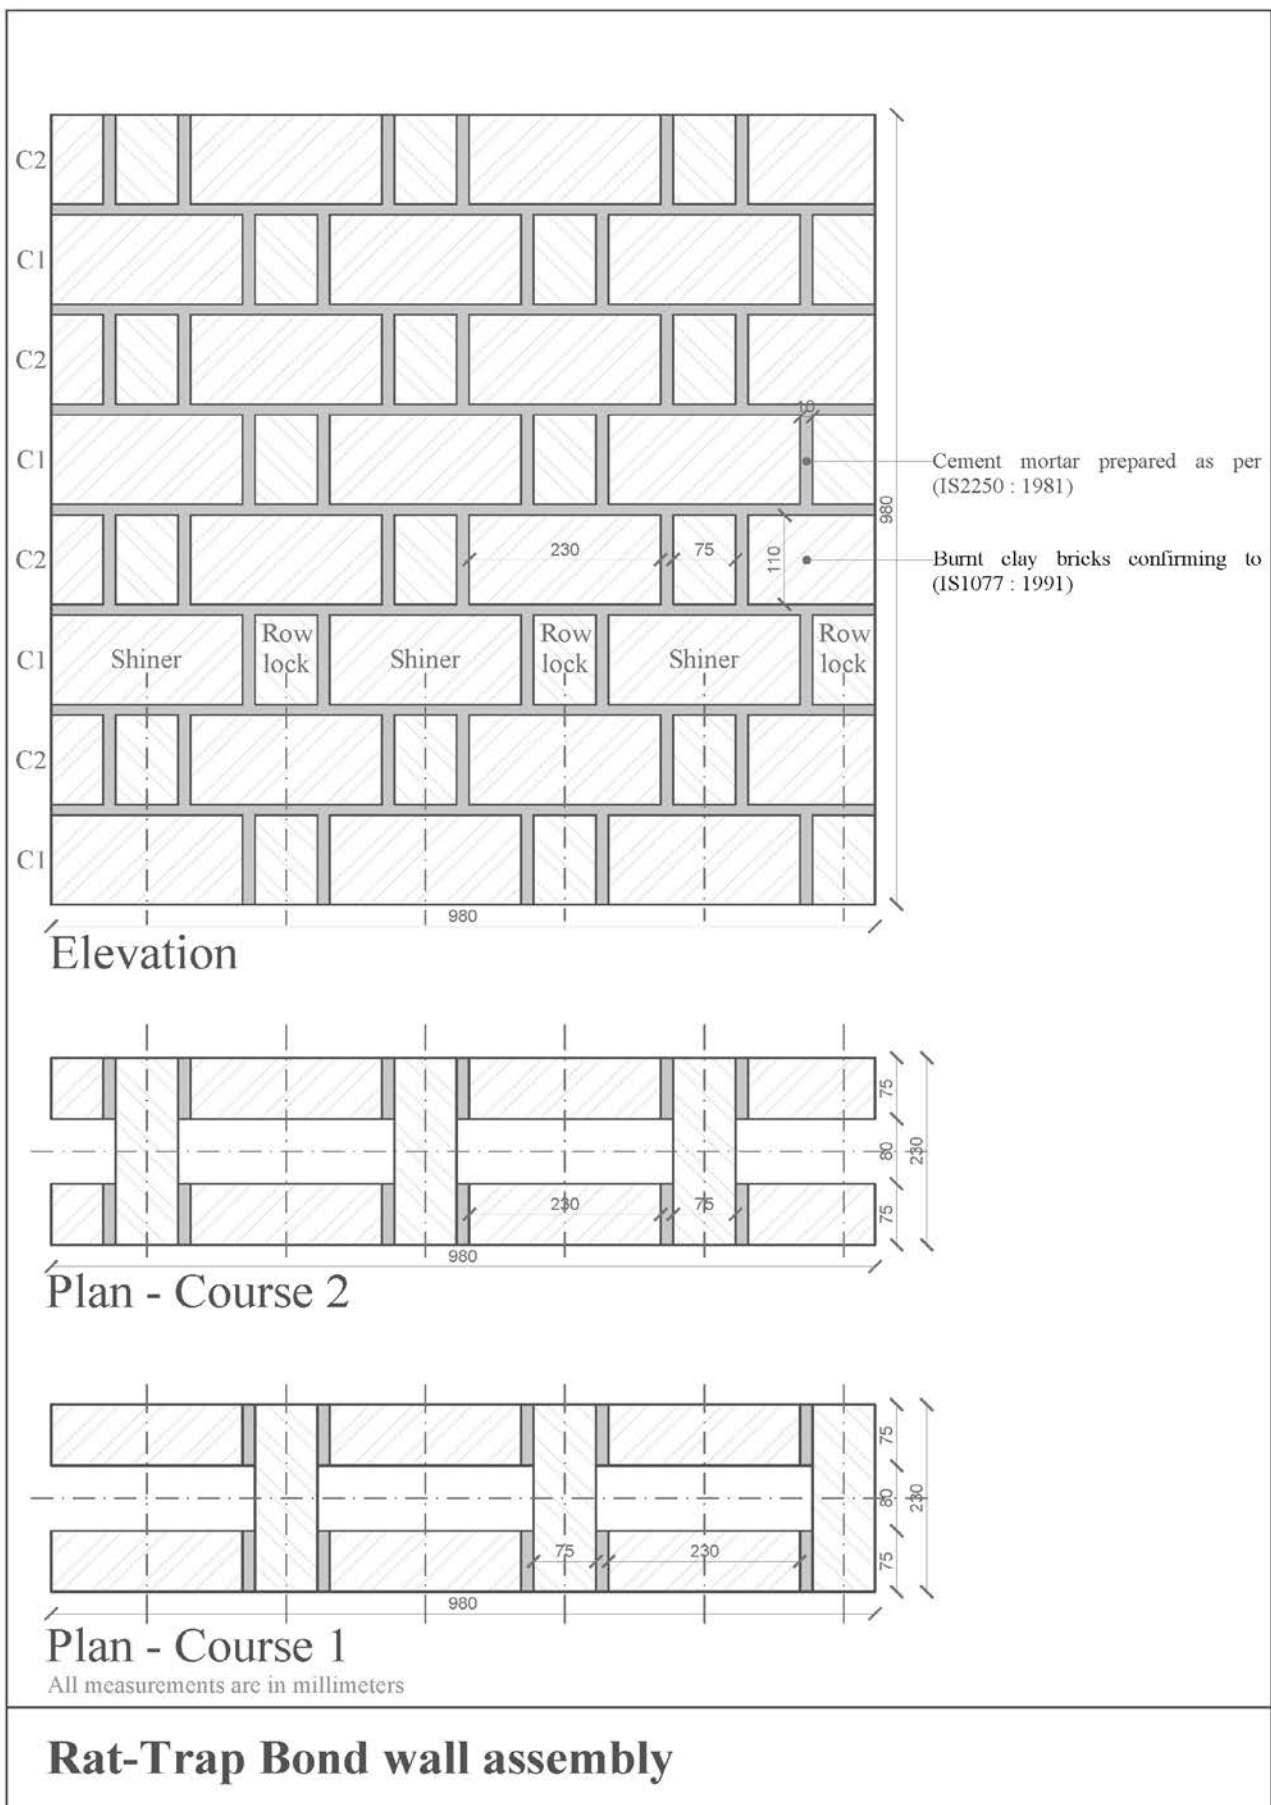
Schematic plans and elevation of Rat-trap bond wall.
